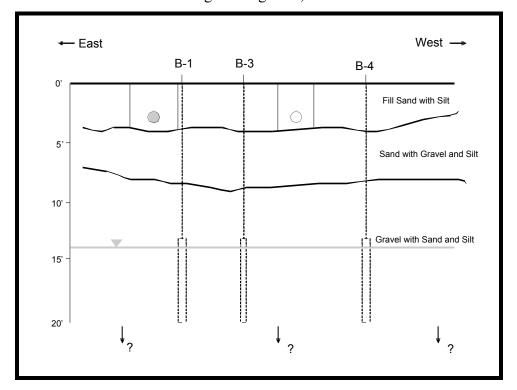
Cross section through B-1, B-3 and B-4. Scale shown on left side. No vertical exaggeration. Boring locations described below. Drainfield trench on left, trench for parking lot infiltration line is between B-3 and B-4. B-5 was not soil sampled and is therefore not shown.
